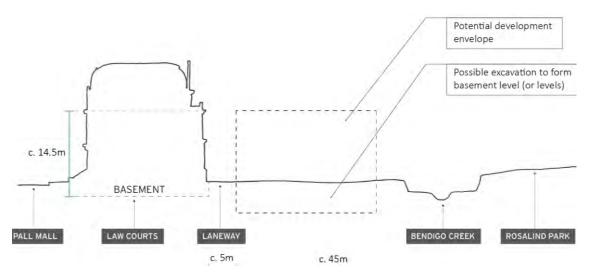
Site 1 – Bendigo Law Courts: potential development envelope
